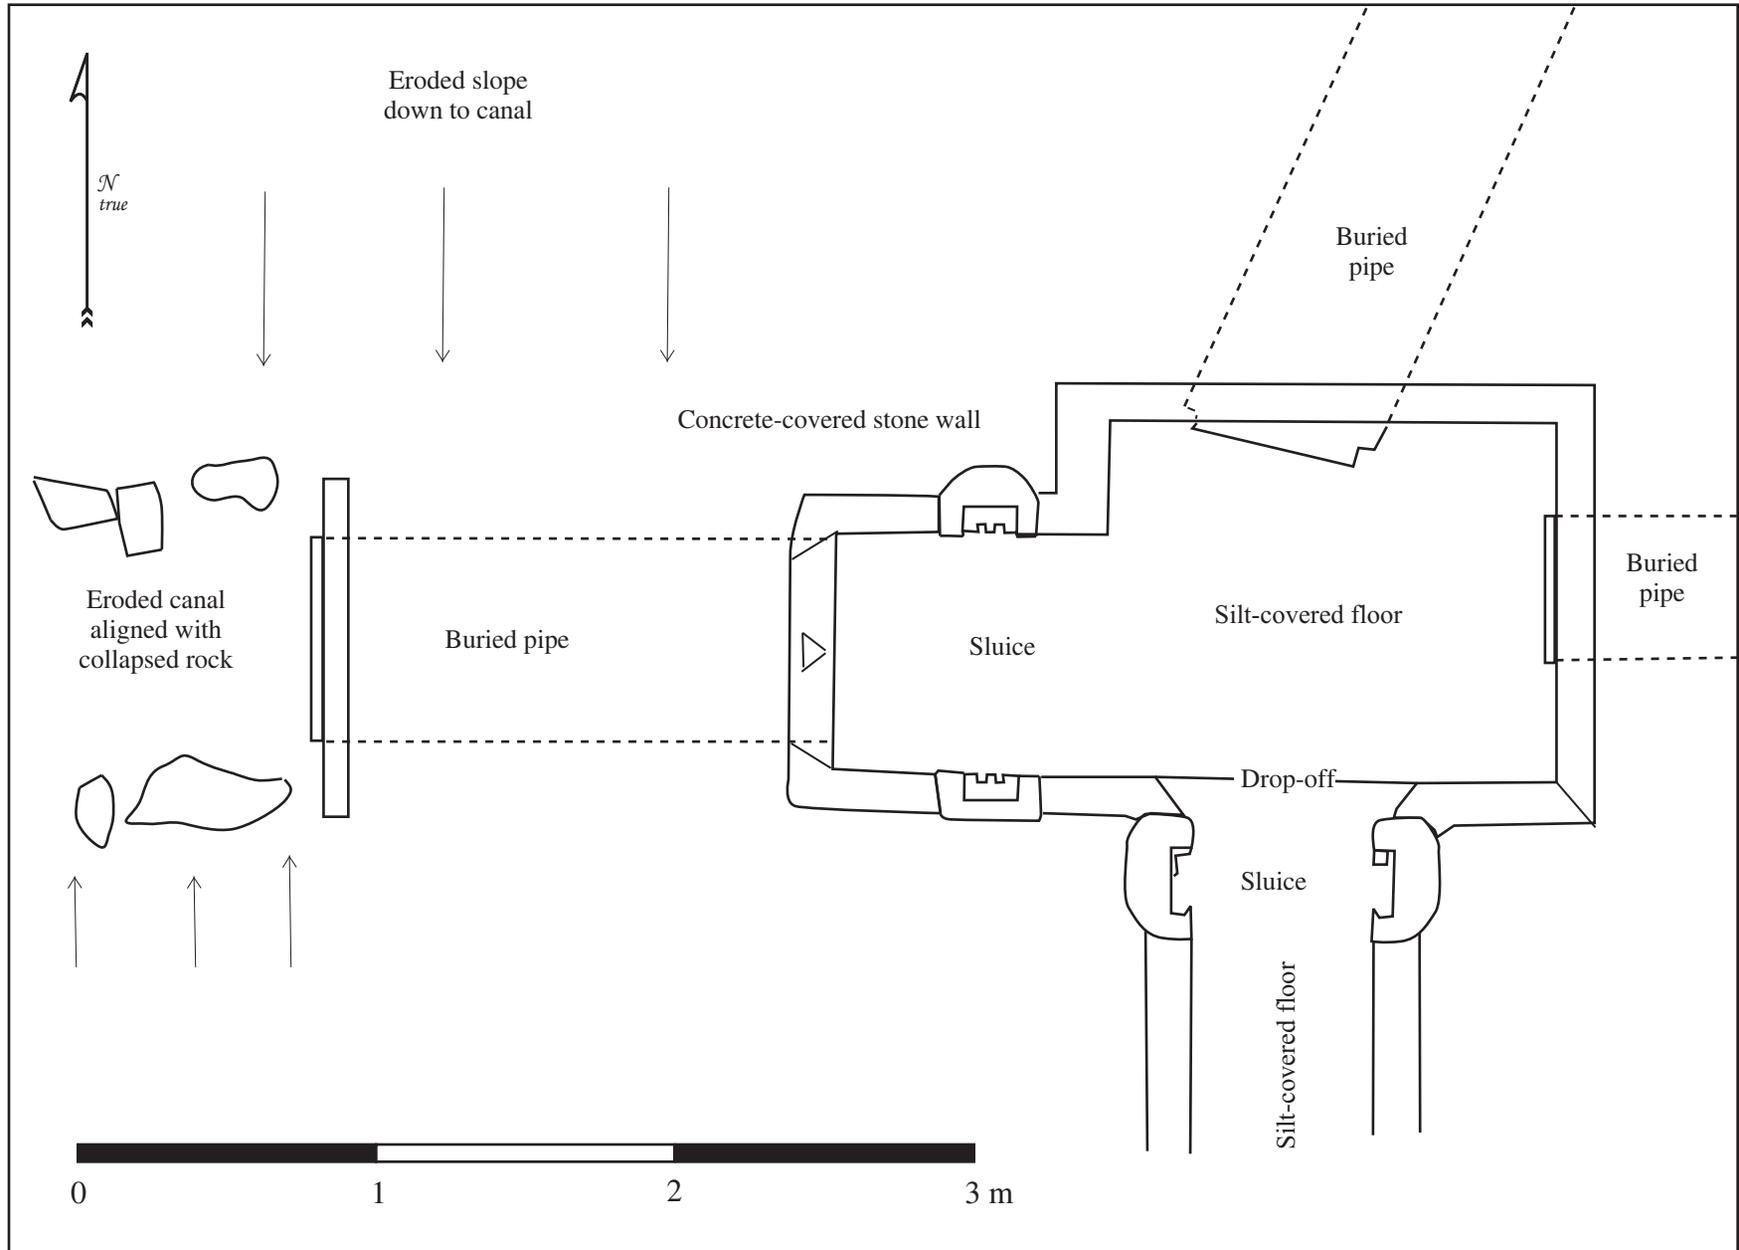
Site 7159 Section 12 sluice gate complex plan view.
